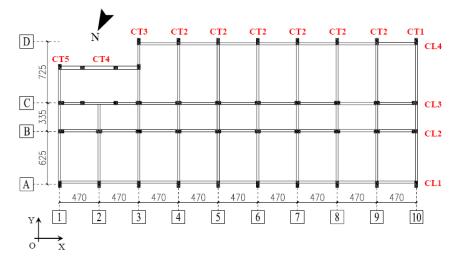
FCCIA building. Plane view of current storey (Lozinca, 2009)
